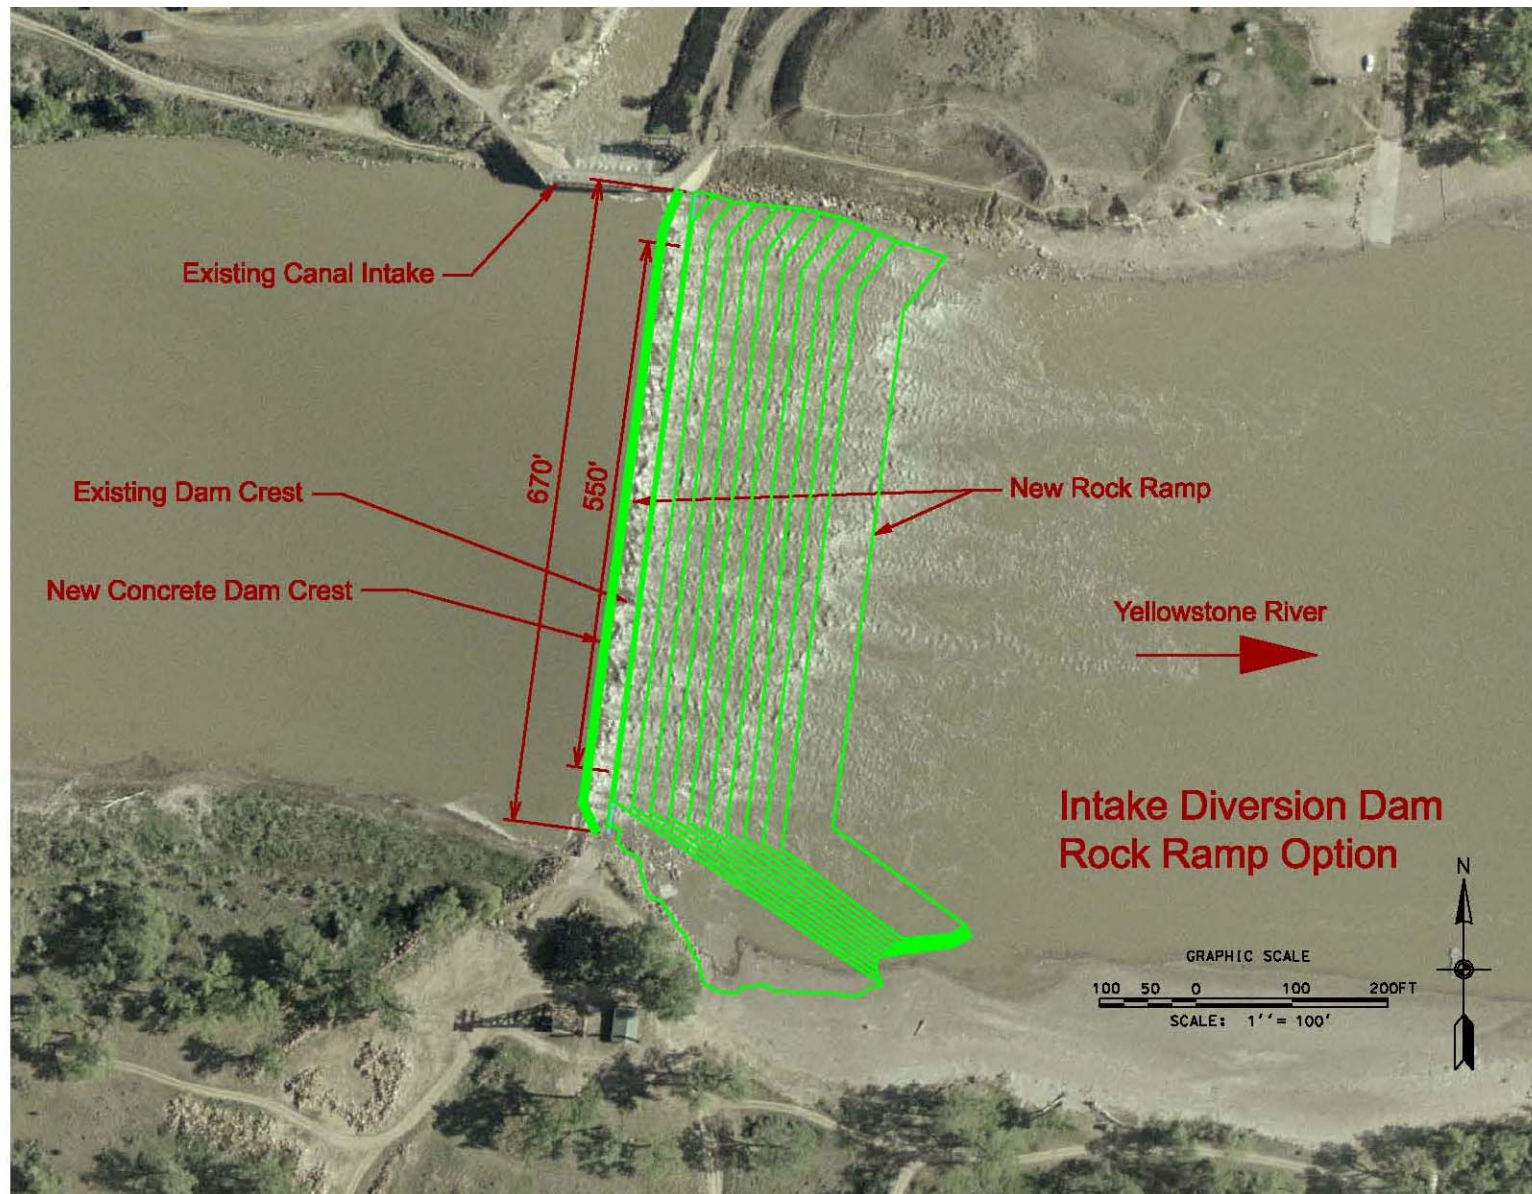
Conceptual View Intake Diversion Dam Rock Ramp Option.
